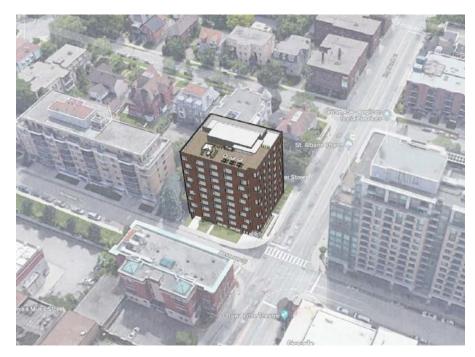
Bird's Eye view looking south east at the intersection of Besserer Street and King Edward Avenue illustrates the new development and its relationship with the neighbouring buildings.
